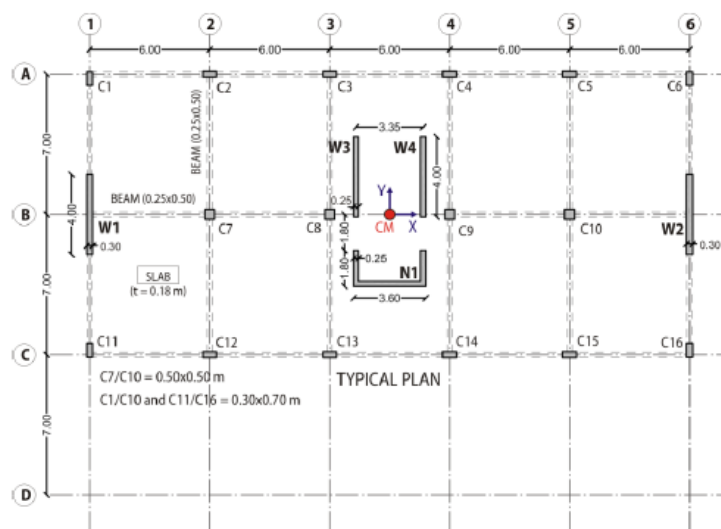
Typical floor plan. Adapted from Bisch et al. (2012).
